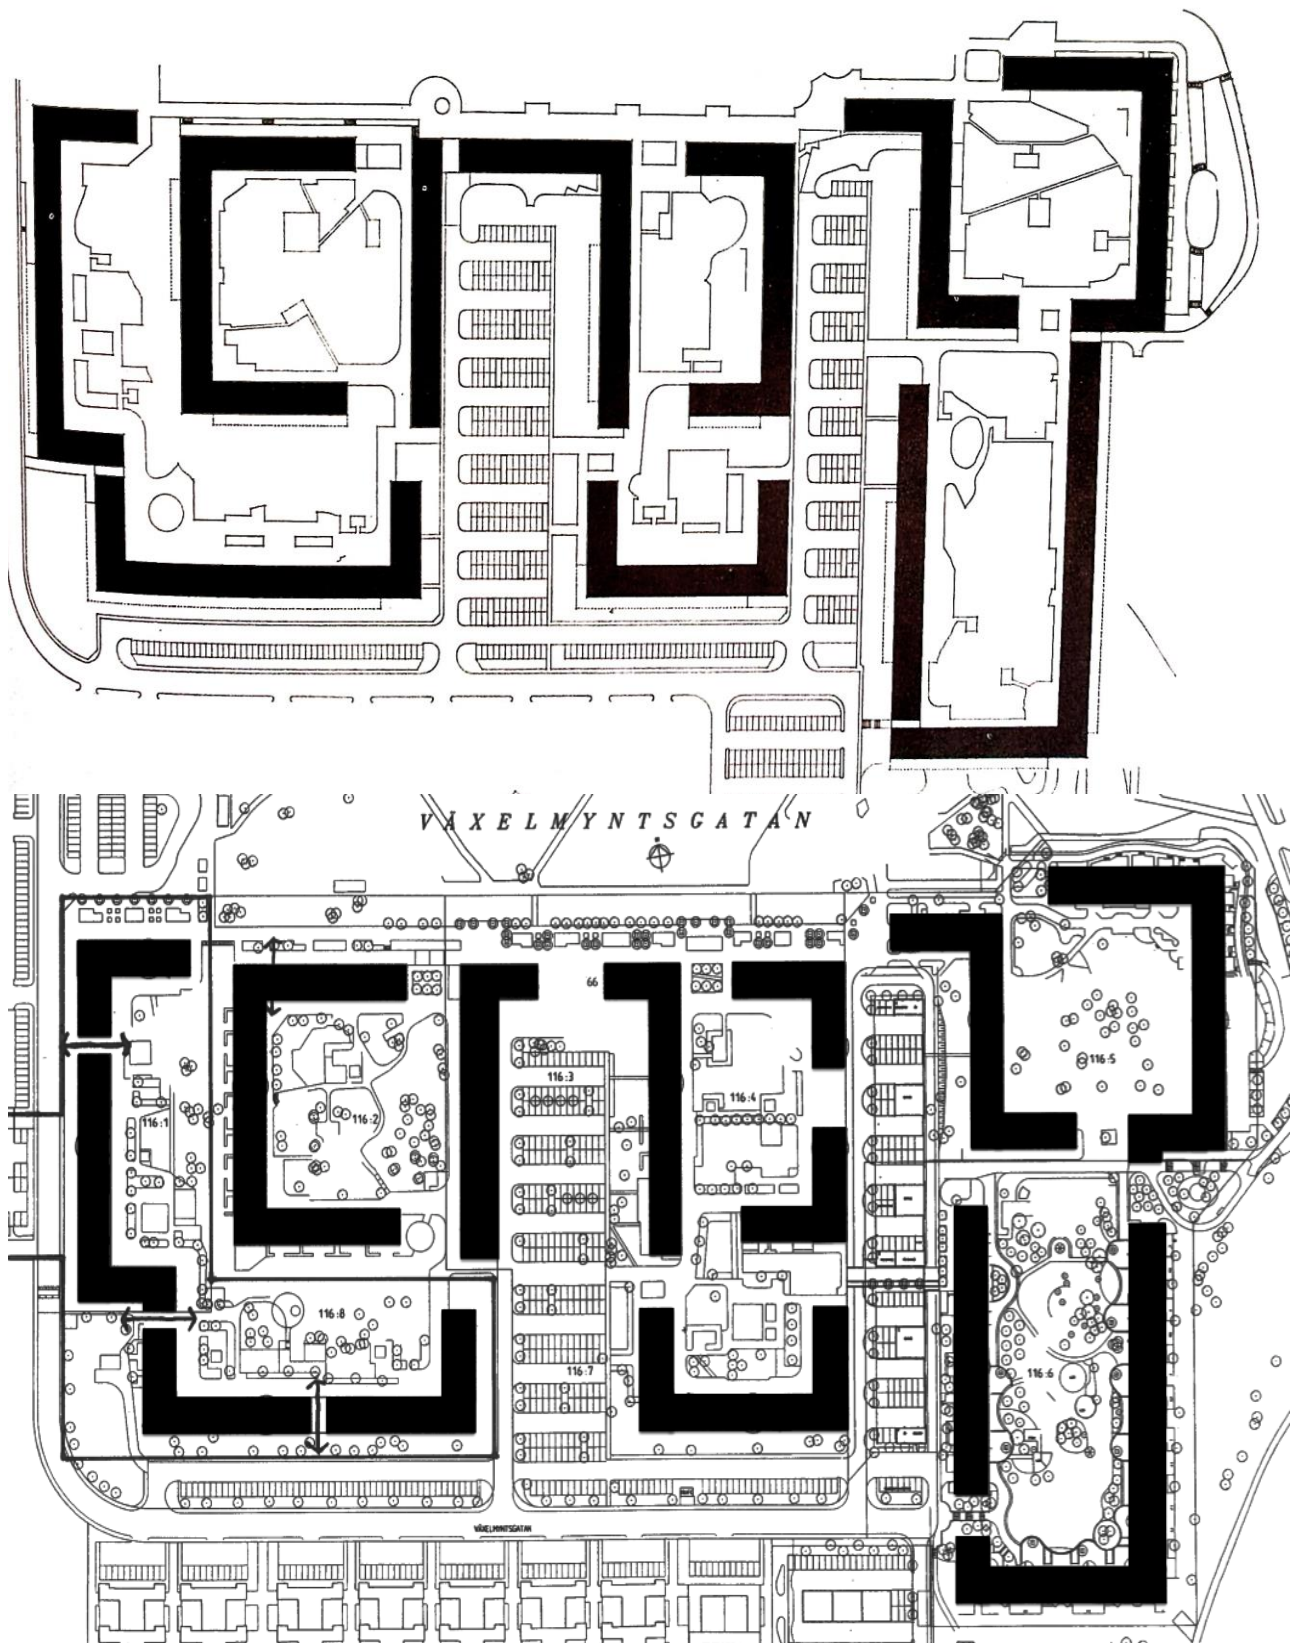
The houses of Växelmyntsgatan. The plan (top) shows the buildings before the refurbishment while the lower plan shows the buildings afterwards
